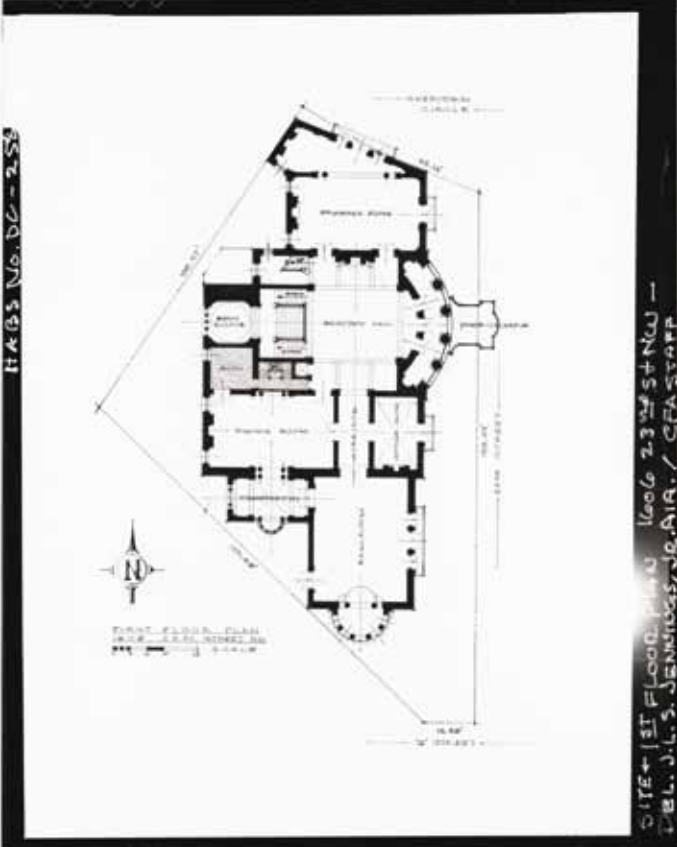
Main Floor Plan of Everett House (Source: Library of Congress)
